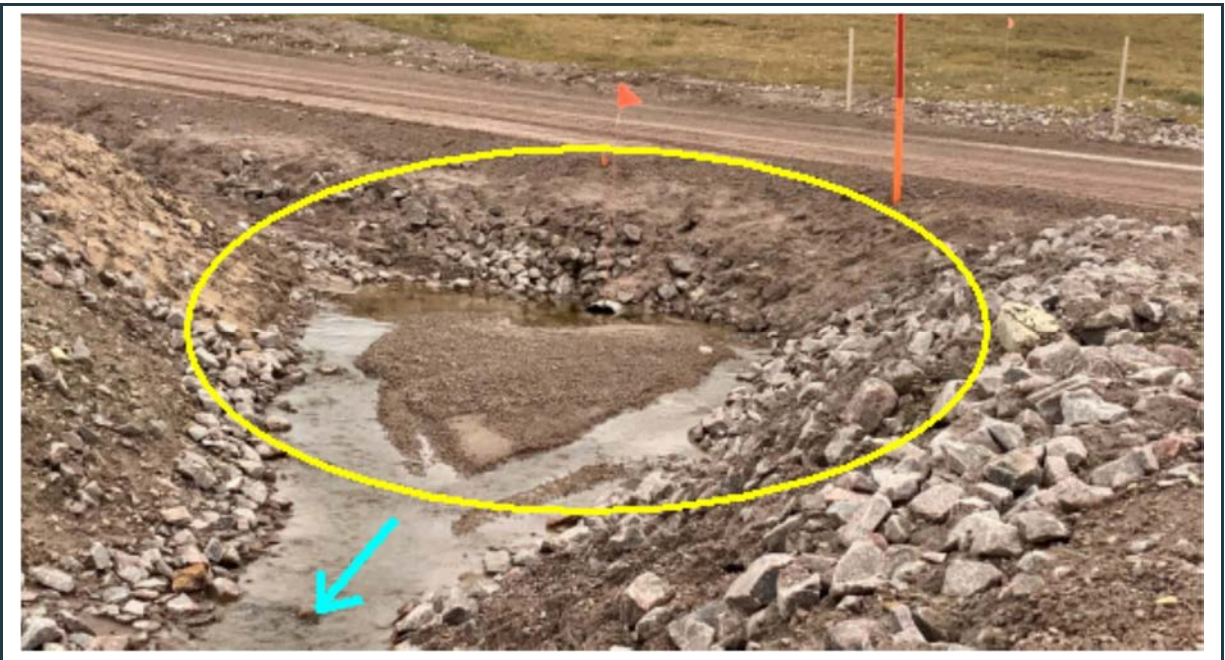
View of the outlet of the culvert at KM 32+900. The ditch at the front of the culvert should be cleaned from the sediment during culvert replacement, and more riprap should be placed.
